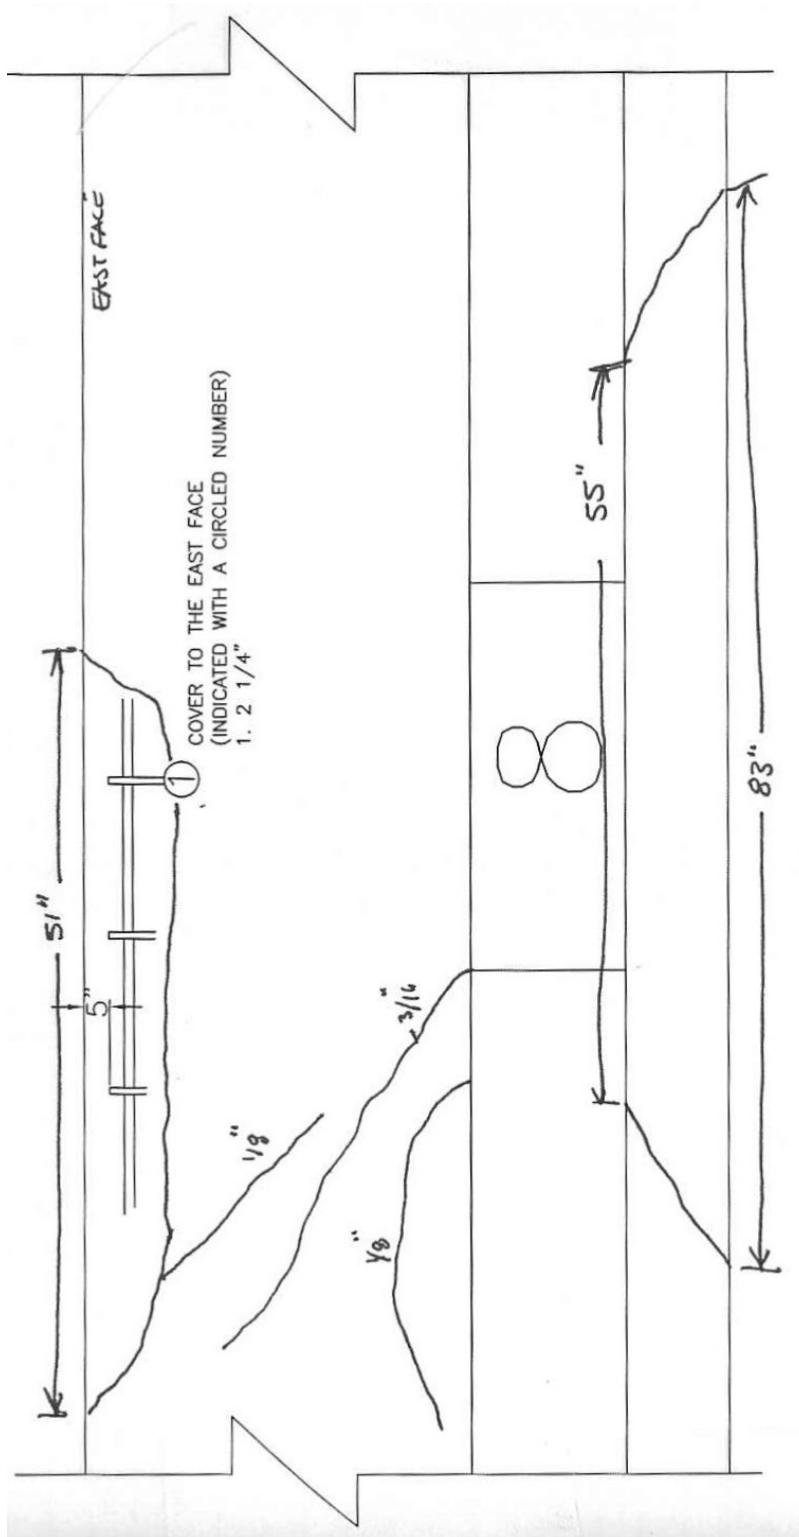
Concrete Damage – Back-side of Rail at Post No. 8, Test ACBR-1
